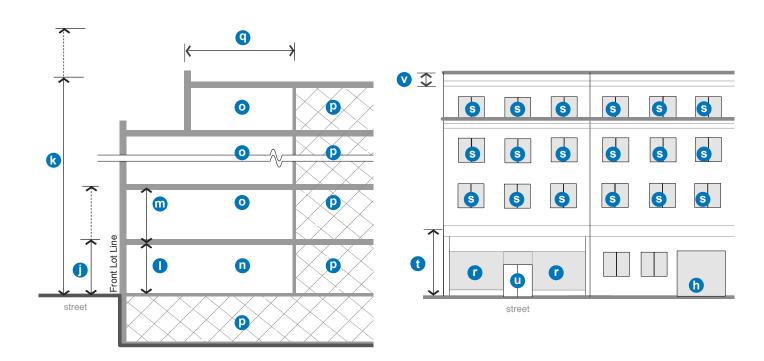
(2). Limited Bay Building: Height & Use Requirements.
